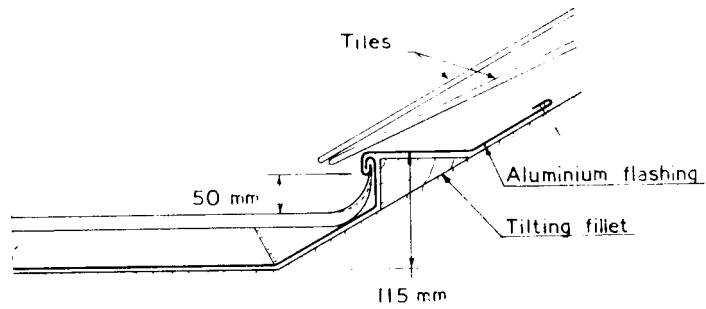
Slated or tiled roof discharging on to aluminium flat roof
